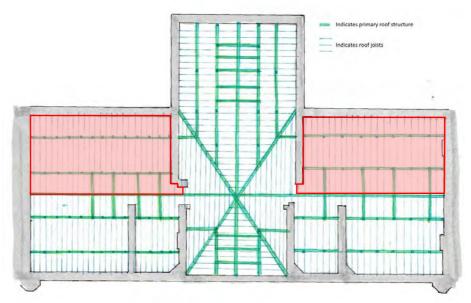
Plan of the existing roof structure showing the structure to be removed in red
